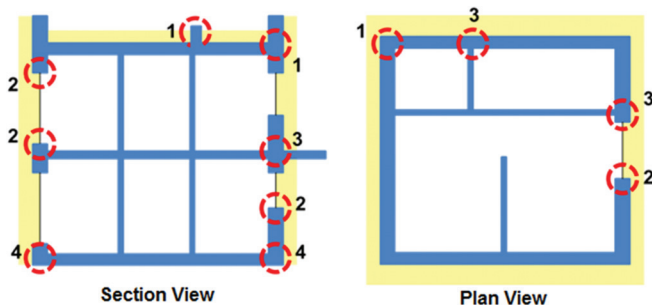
Building envelope thermally vulnerable locations. Section view: (1) eaves/ridge, (2) window and door fittings (head, sill and jamb), (3) projections, shades or intermediate floors, (4) grade (building foundation). Plan view: (1) wall corner, (2) threshold or door, (3) internal-walls-to-external-walls intersections.
